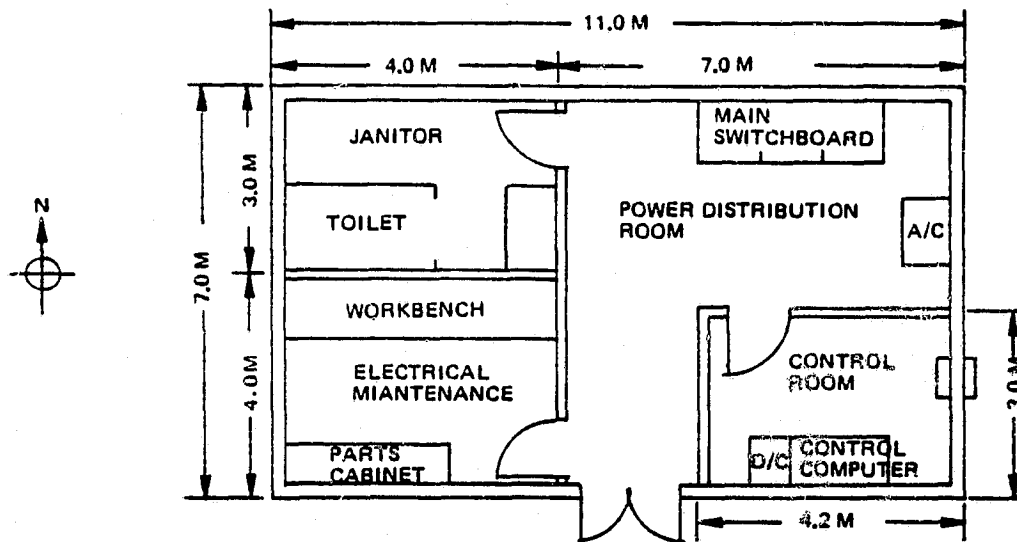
CONTROL BUILDING FLOOR PLAN (NO STORAGE)
